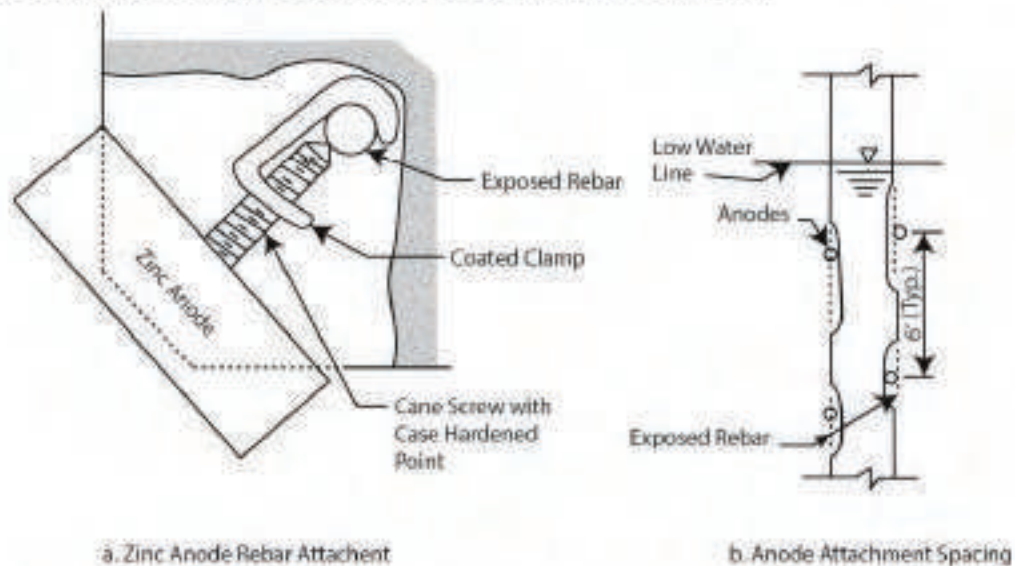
Galvanic Cathodic Protection of Concrete Piles (Underwater)
